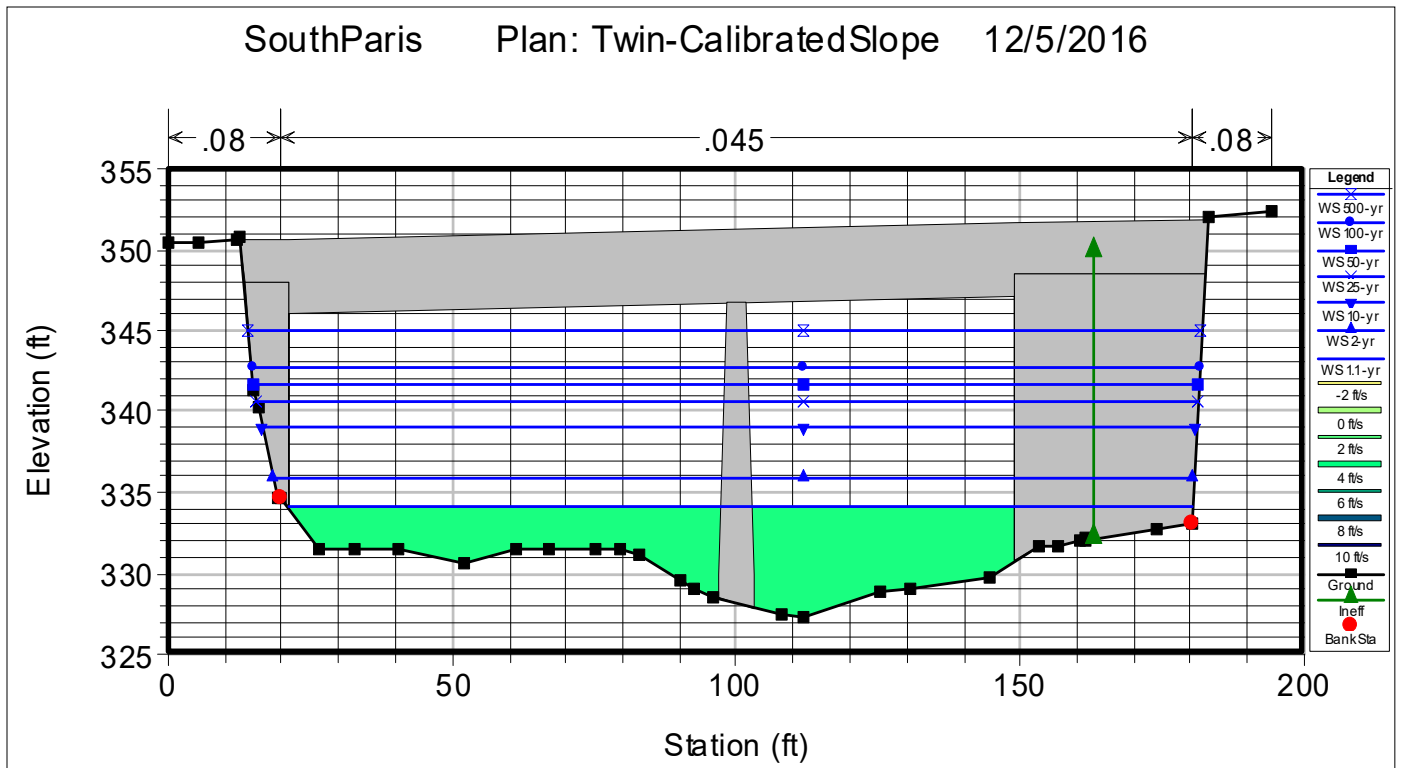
Proposed Twin Span Bridge section, upstream face, plotted facing downstream.
